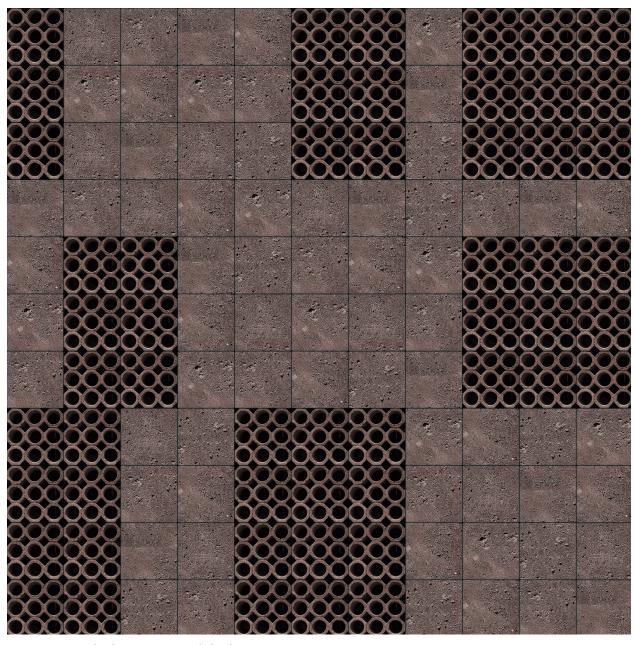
Proposed Reforma towers Tezontle facade.
